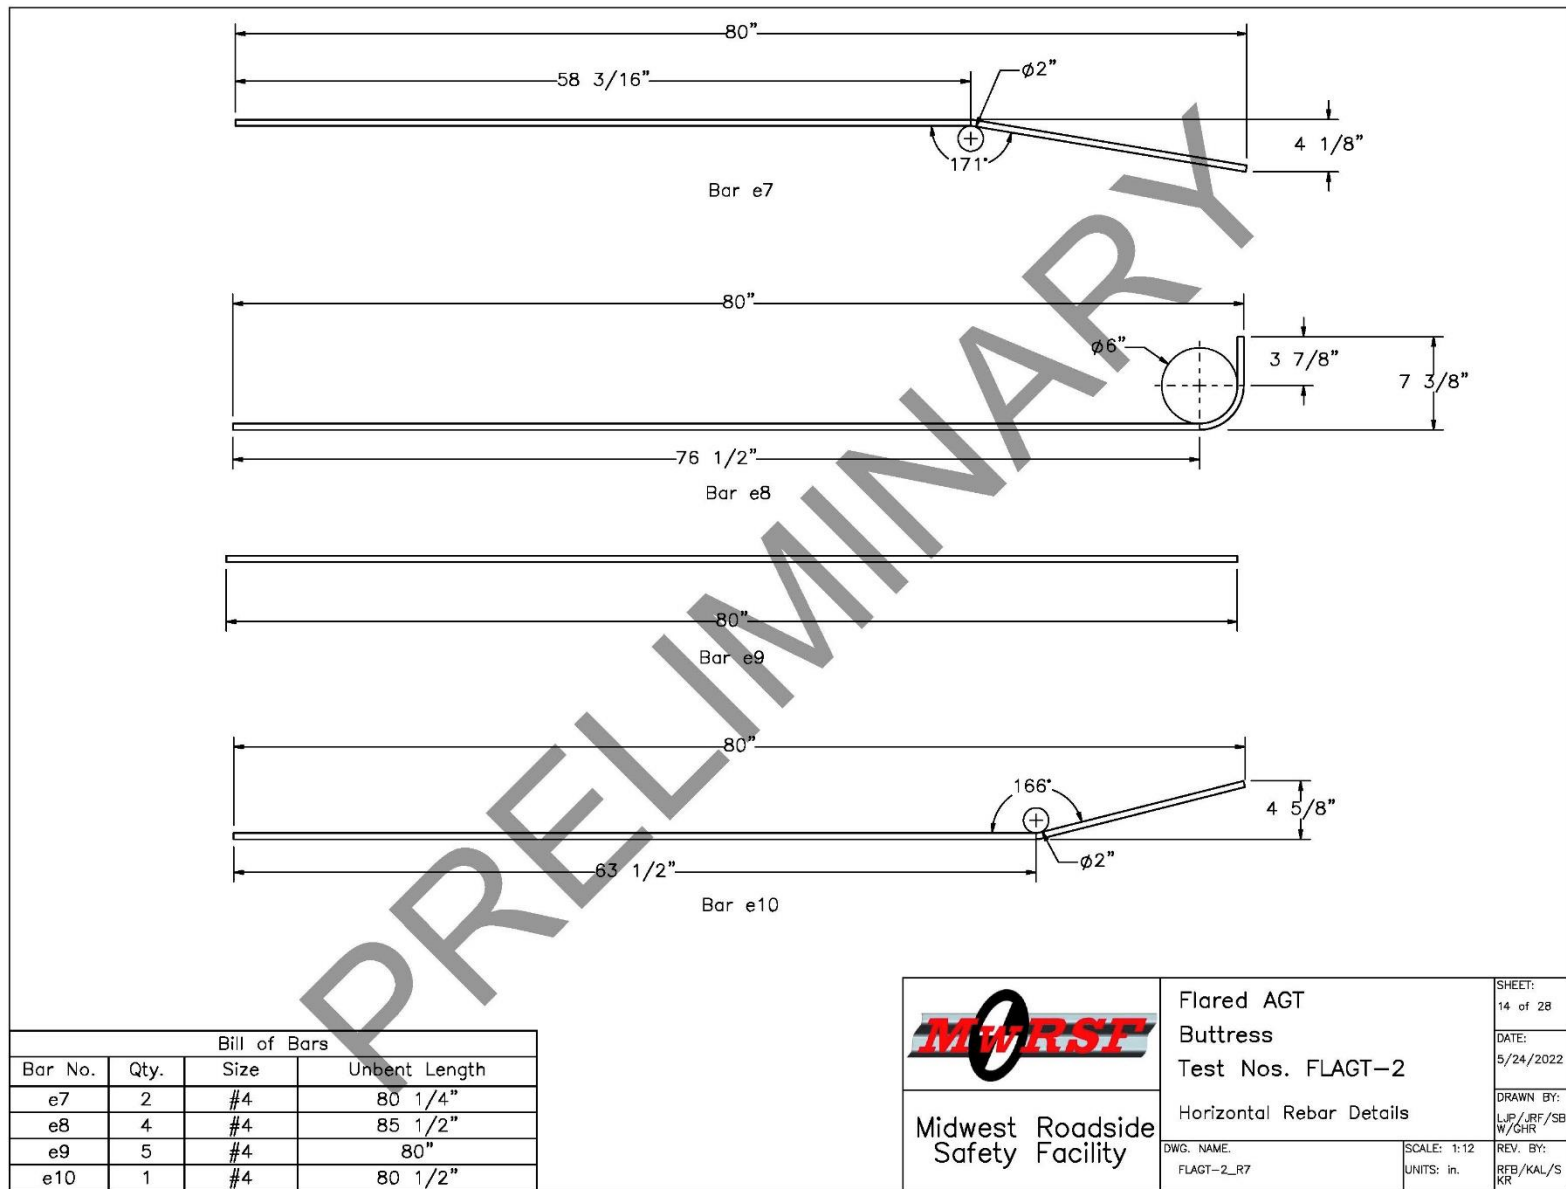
Horizontal Rebar Details, Test No. FLAGT-2
